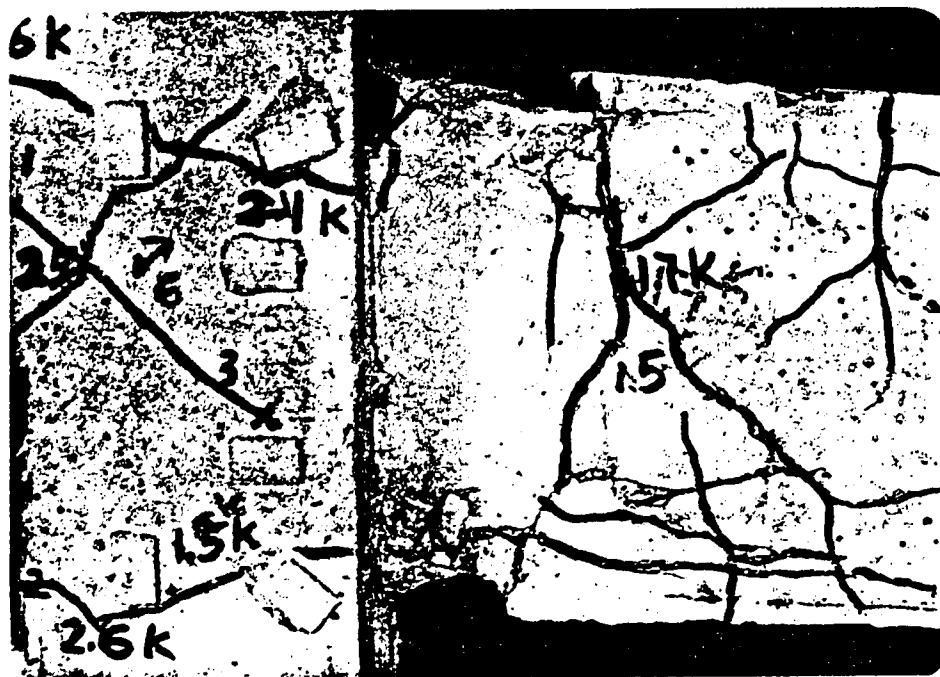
BOND CRACKS OF SPECIMEN 1 AT FAILURE
